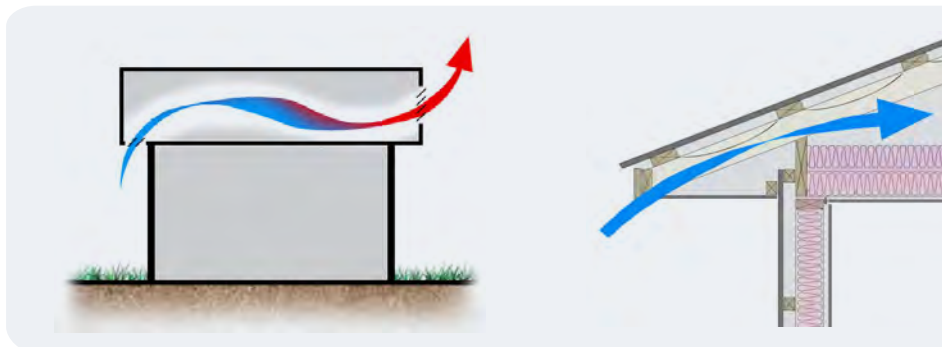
Ventilate roof spaces. Ensure the attic or cathedral roof space is ventilated.
